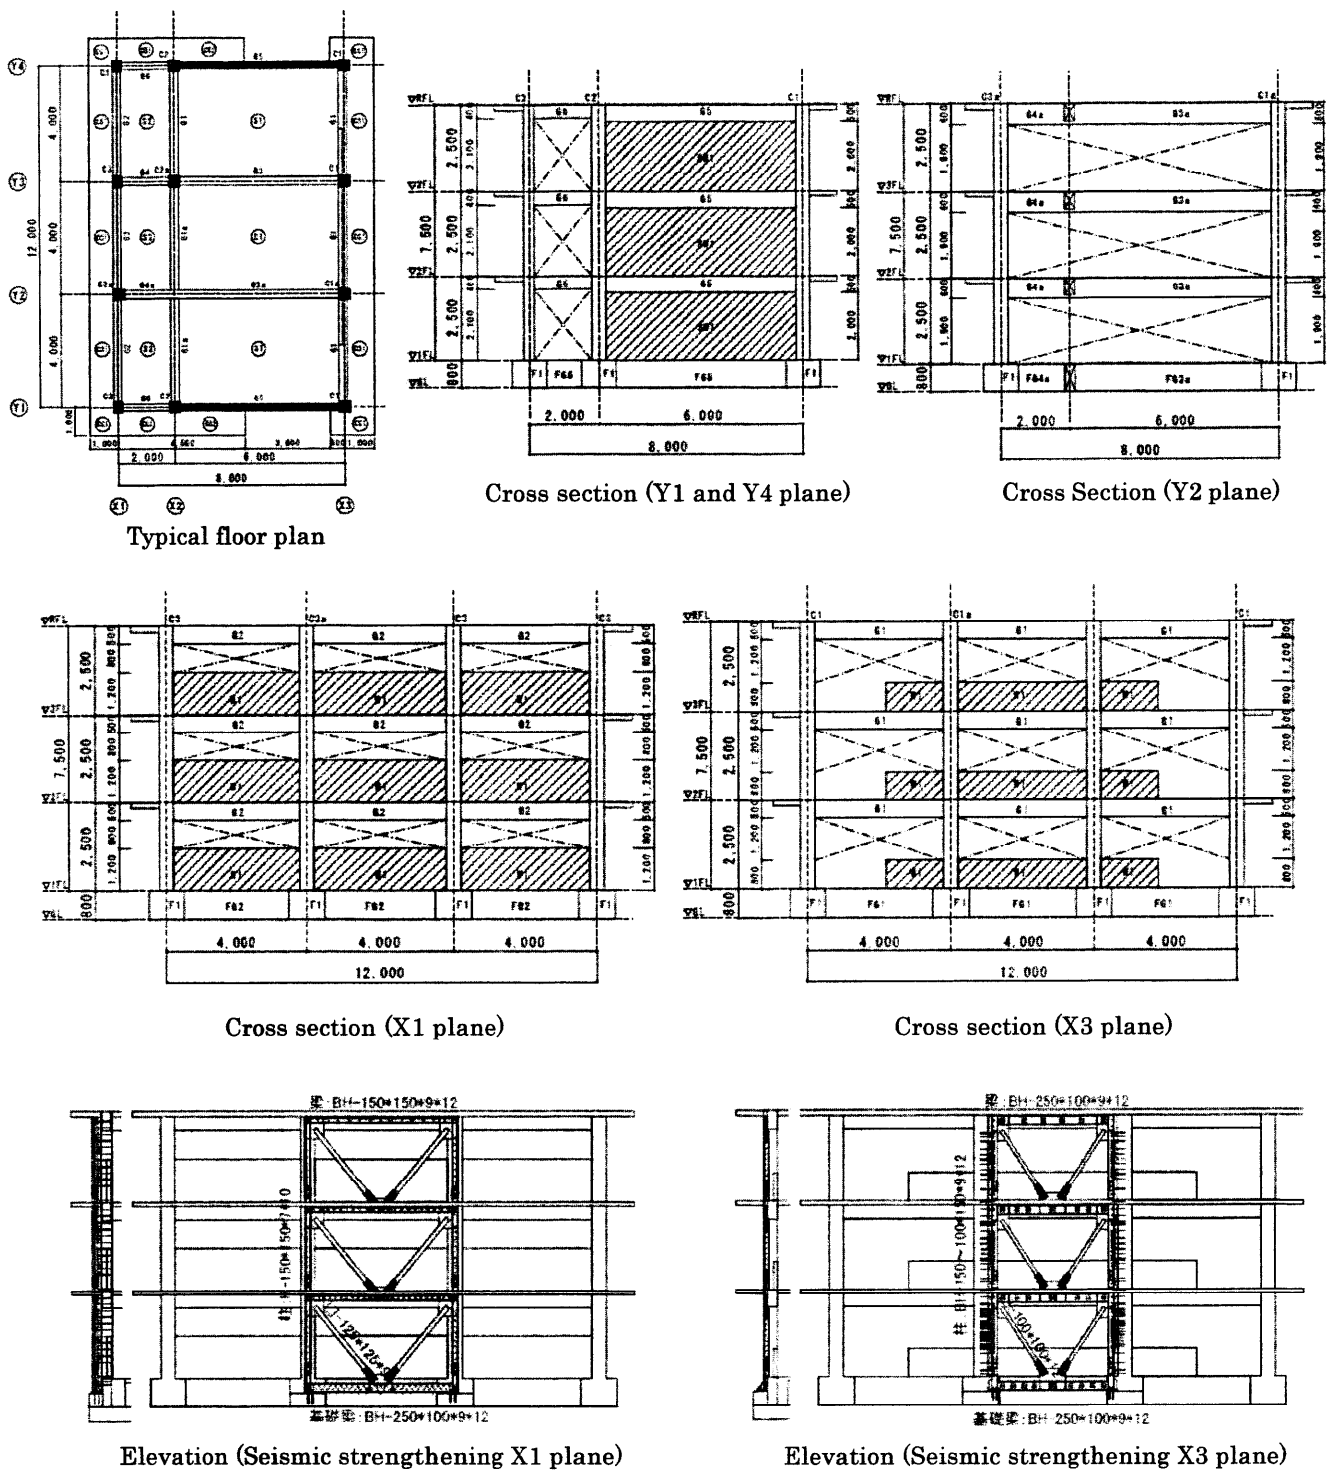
Typical floor plan, cross section and framing elevation<sup>1)~3)</sup>
